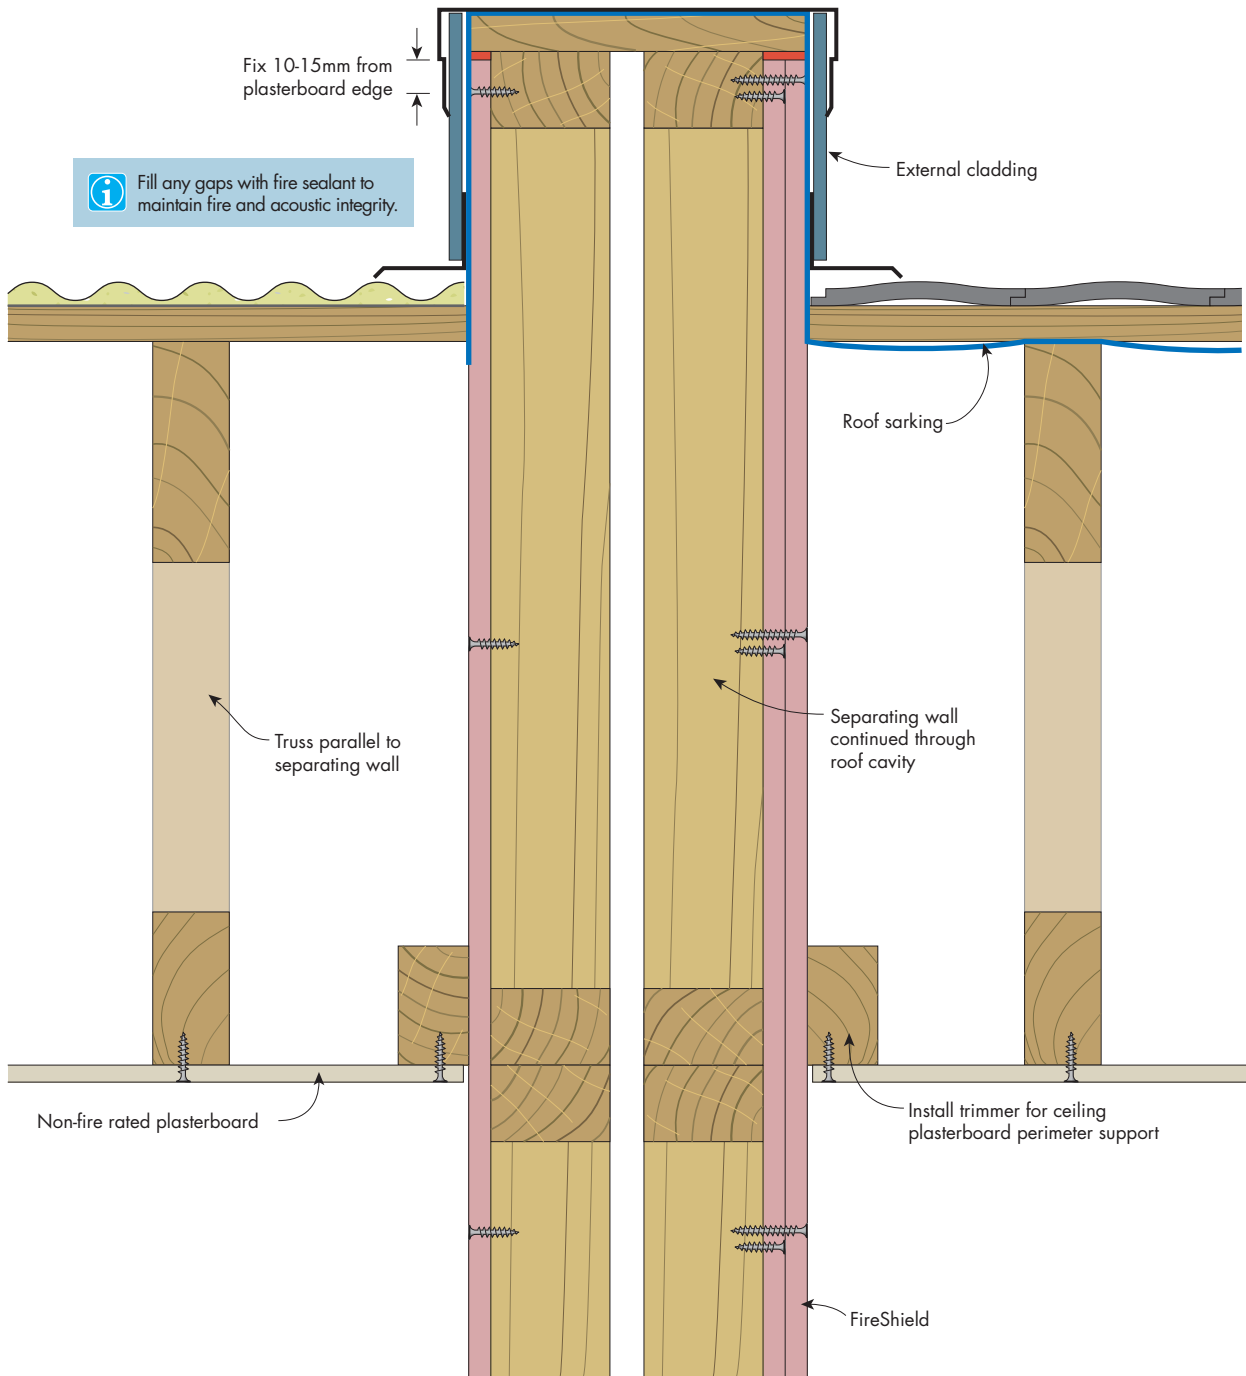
Separating Wall to Parapet Roof with Parallel Roof Trusses
